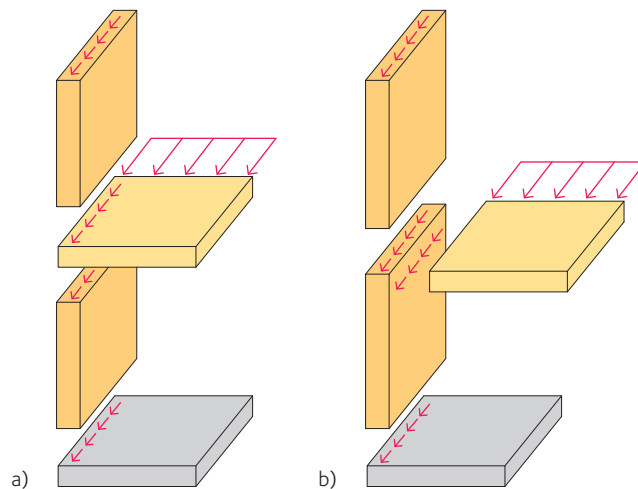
Transfer of horizontal forces between floor slabs and wall elements
